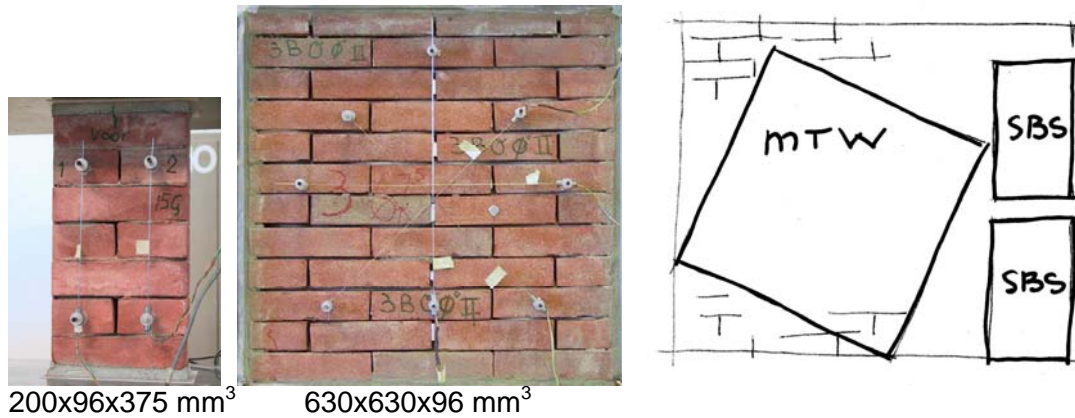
Stack bonded specimen and main test wall, cutting scheme.
